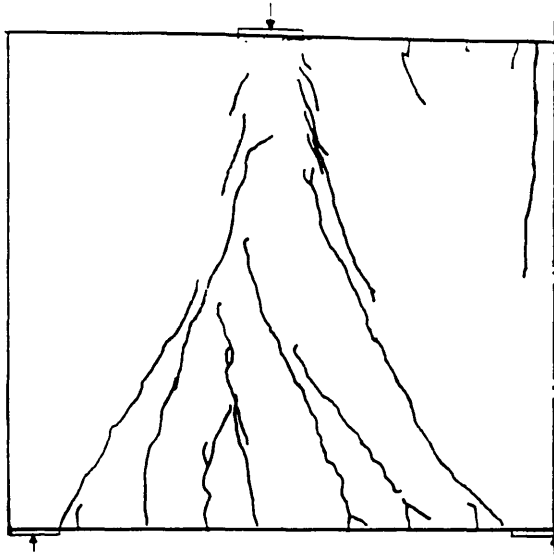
Predicted crack pattern and deformed shape at 600kN (TRGRAS2)
